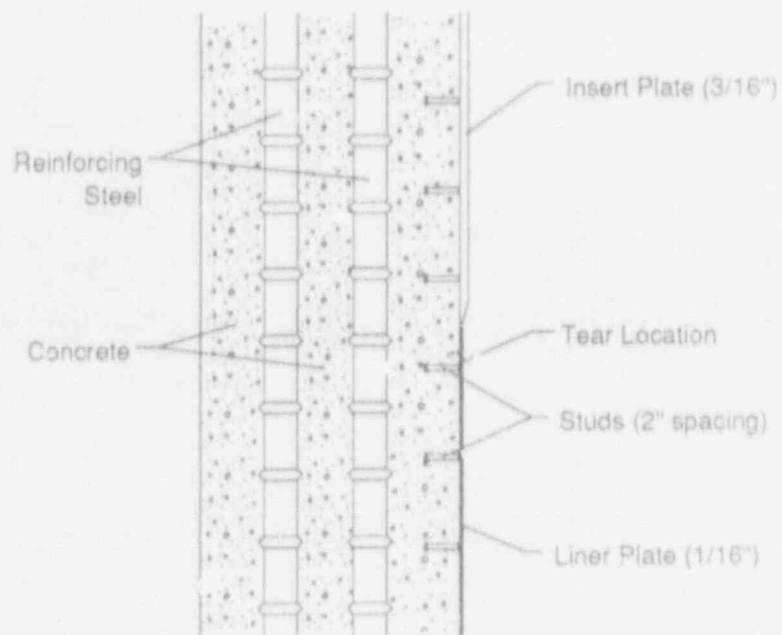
Top View of Cross-Section Through Reinforced Concrete Wall
